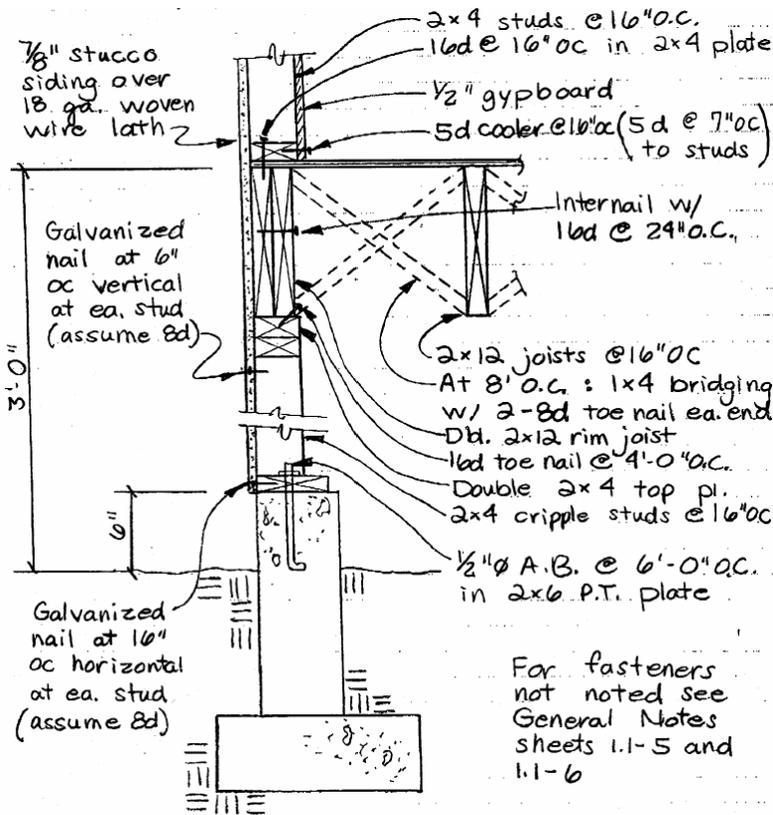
Exterior cripple wall parallel to joists (detail 10-S2)
